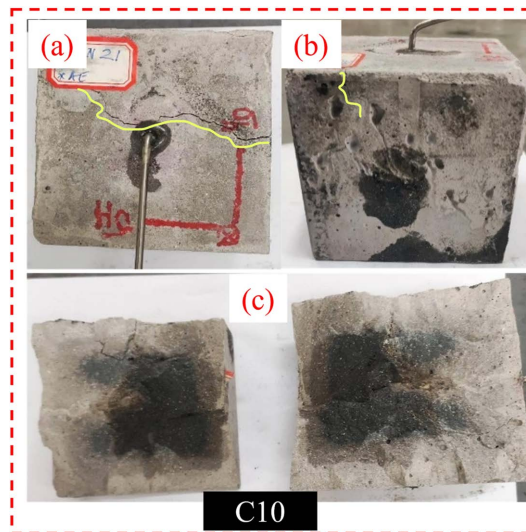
Tested sample C10 (a) HF direction, (b) HF development, (c) fracture surface.
